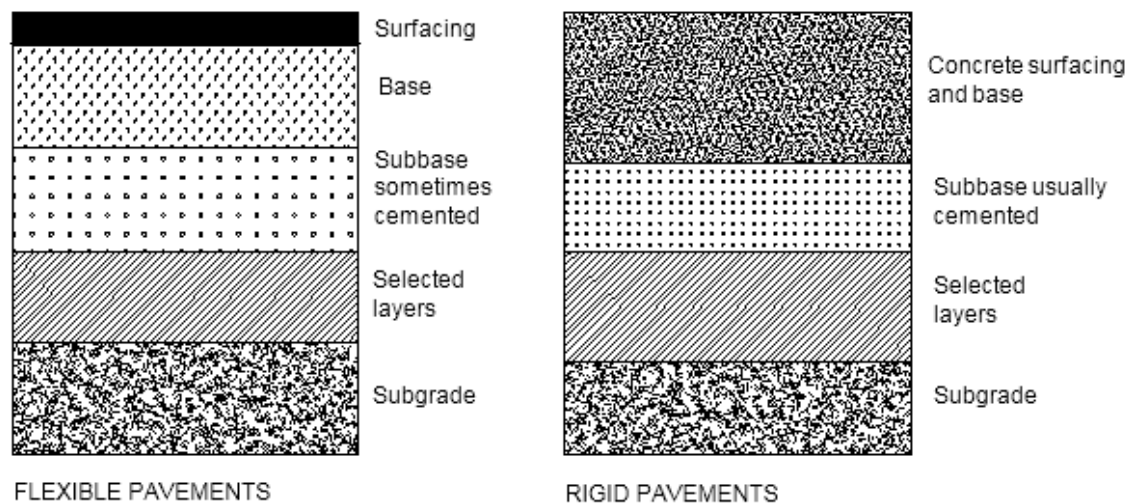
Typical cross sections of pavement structures (Ntirenganya, 2014)
